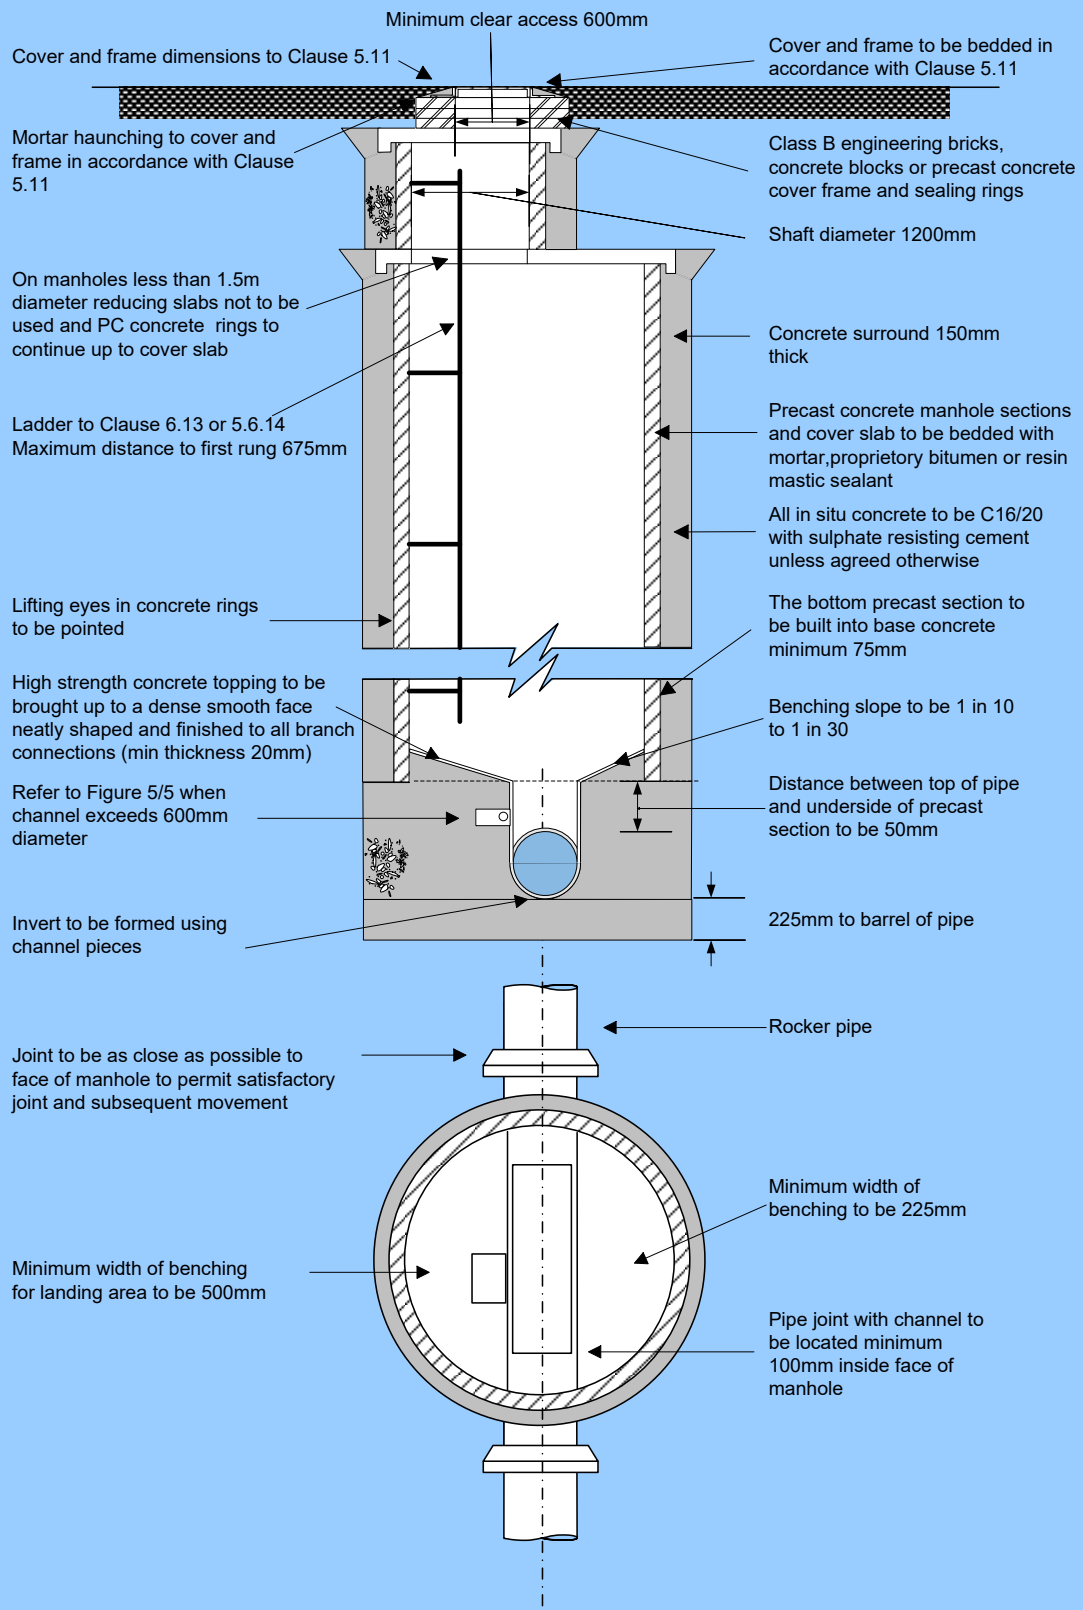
/2 - TYPICAL MANHOLE DETAIL - TYPE B
